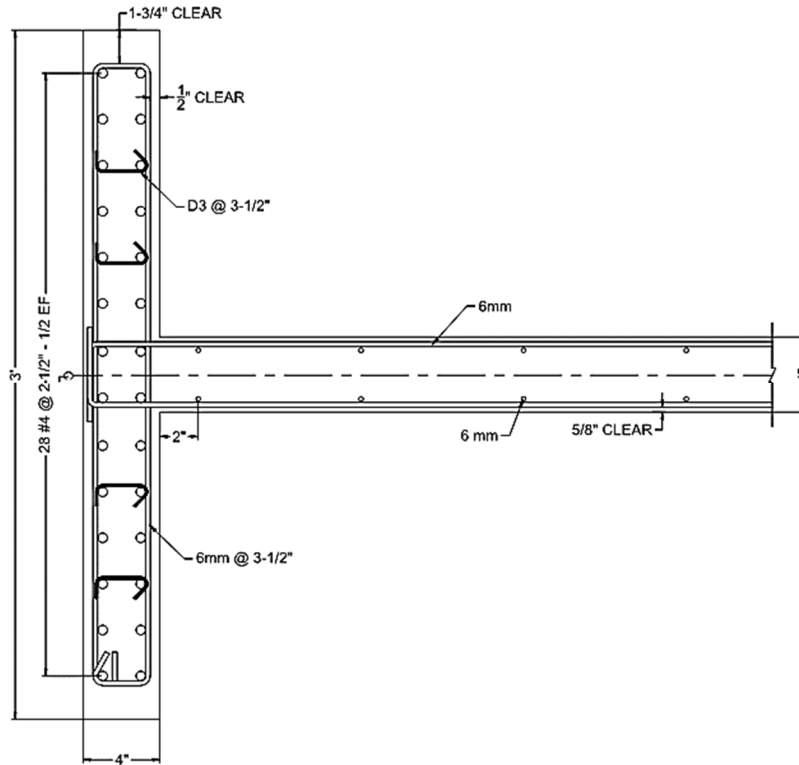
Shear Wall Specimen F1 – Cross Section (Oesterle et al. 1976)
